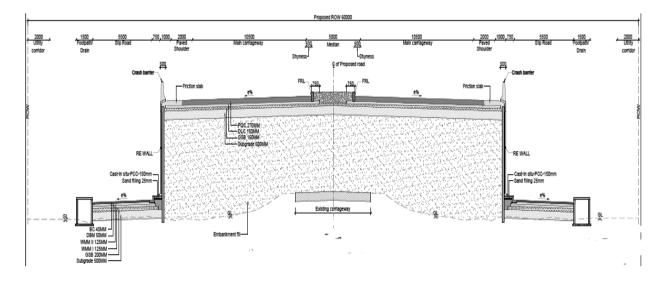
(TCS-6A) 4 Lane Underpass Cross Section With Slip Roads In The Existing Road
